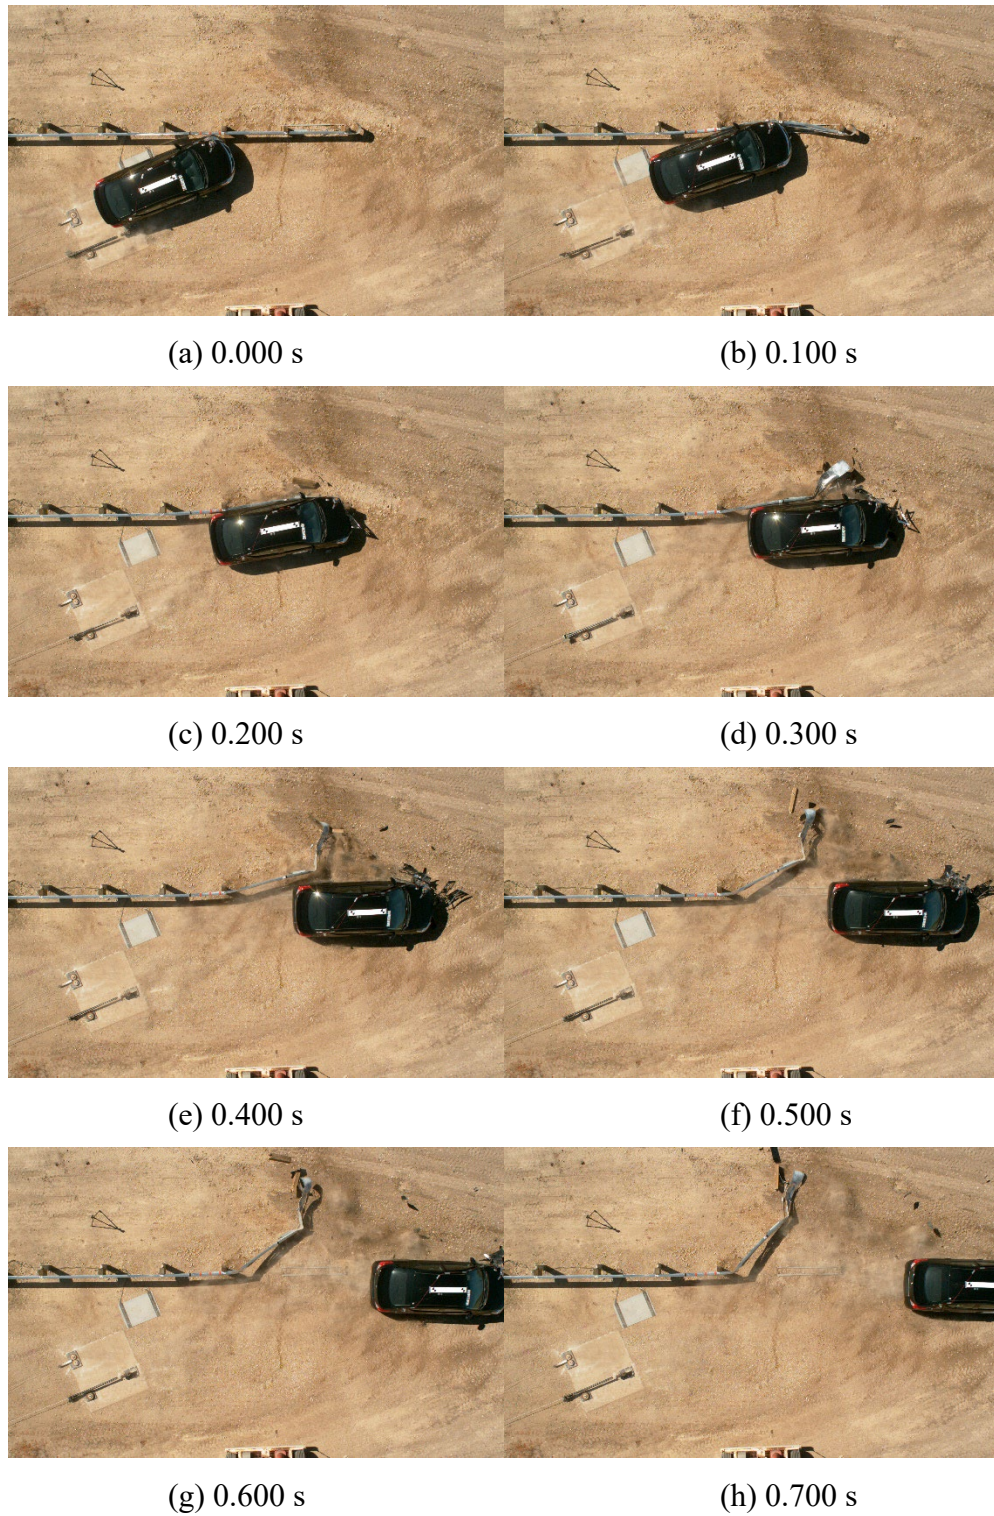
Sequential Photographs for Test No. 615181-01-13 (Overhead Views).
